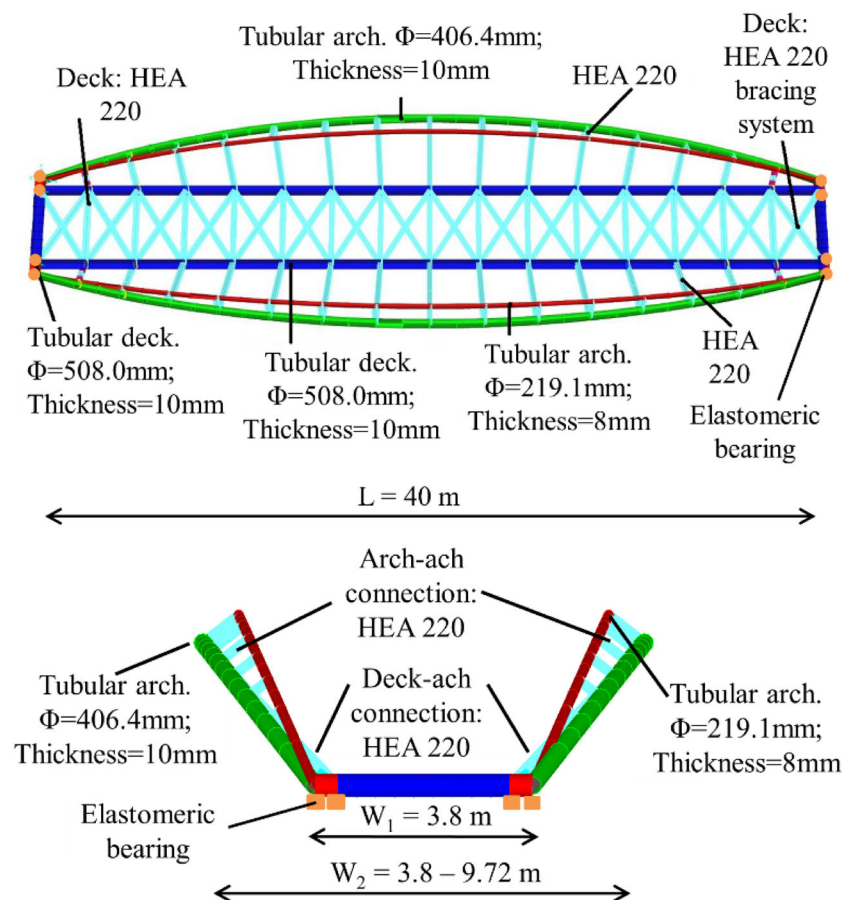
Footbridge over the Velino River: FE model and details of structural elements. Plan view (upper); cross section (bottom)
